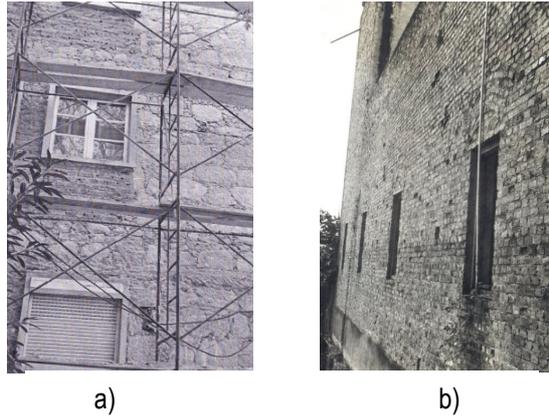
Examples of the different walls used: a) façade walls with rubble masonry (Alegre, 1999) b) gable walls with brick masonry (Lucchese, nd)
